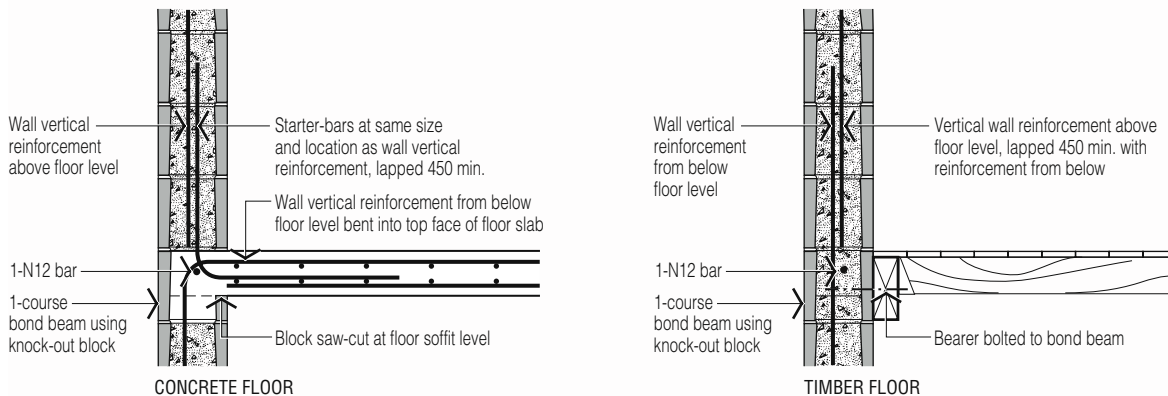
Typical Details for Bond Beams Supporting a Floor
